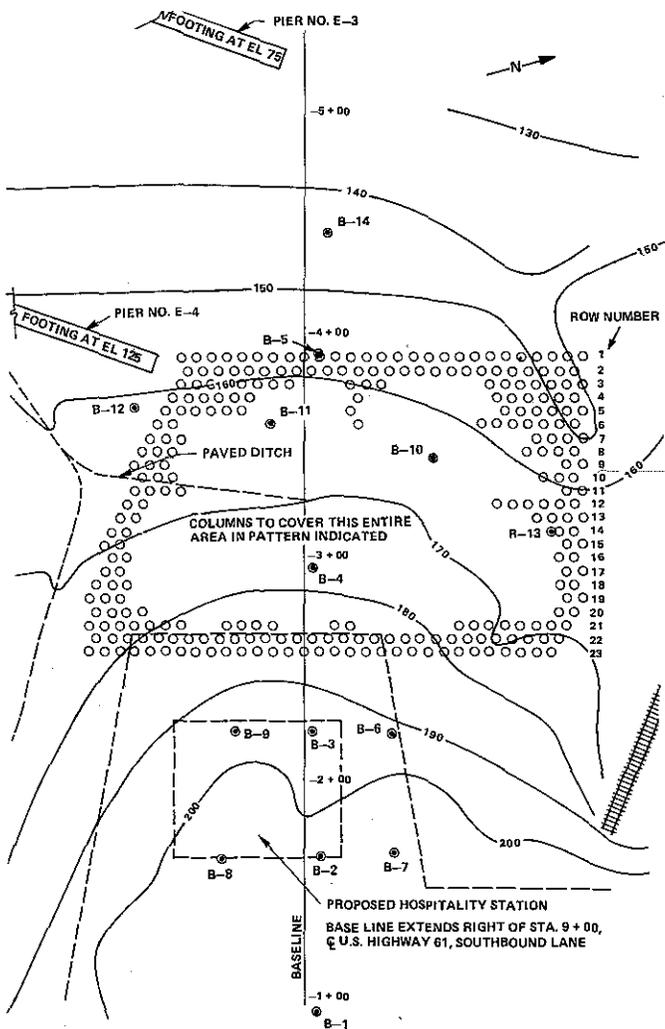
Proposed Stone Column Treatment - Vicksburg, Mississippi
